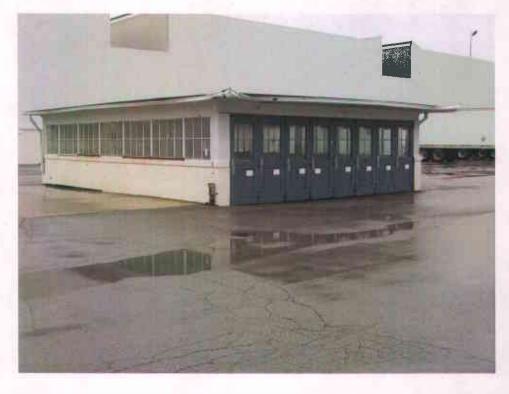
AL013/FRA-8369-12, Building 60 (Employee entrance), looking southwest.
